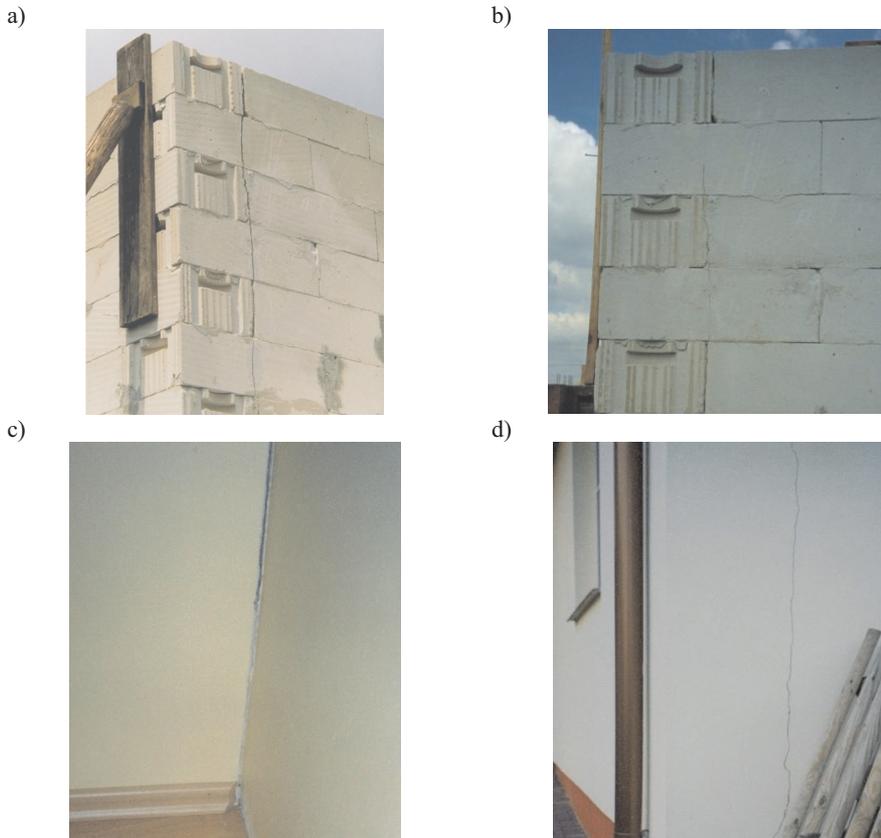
Examples of cracks in walls corners (description in the text)
